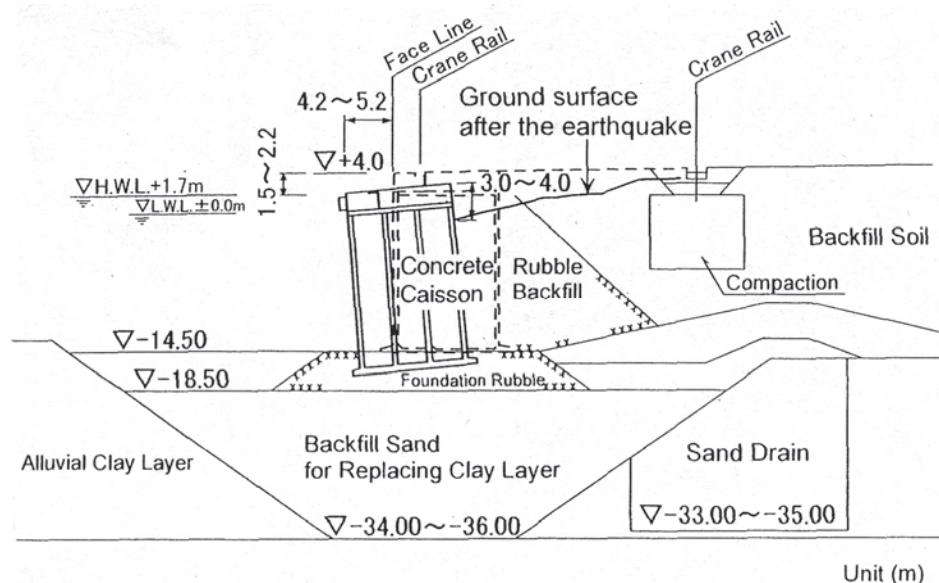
Cross section of caisson wall at Kobe Port showing effects of 1995 Hanshin earthquake (PIANC, 2002).
